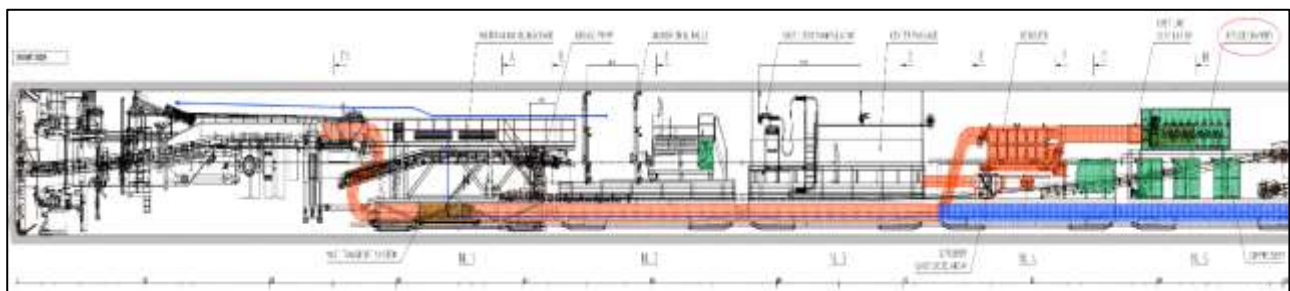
Longitudinal section of an open-type TBM, a rotary drilling machine.
